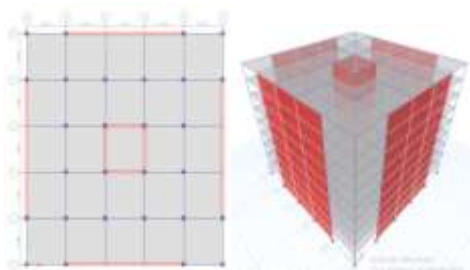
Edge Shear wall (1 bay ) + Core model
